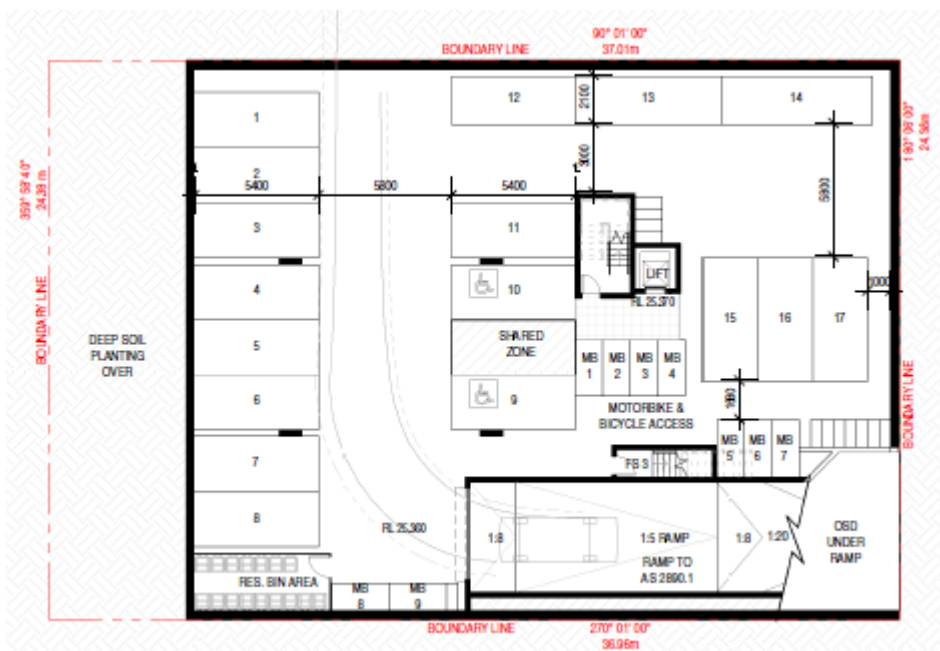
Amended Basement 1 layout. The stair at the rear has been deleted. The commercial car parking spaces have been deleted. Parking for the boarding house has increase from 11 spaces to 17 spaces.
